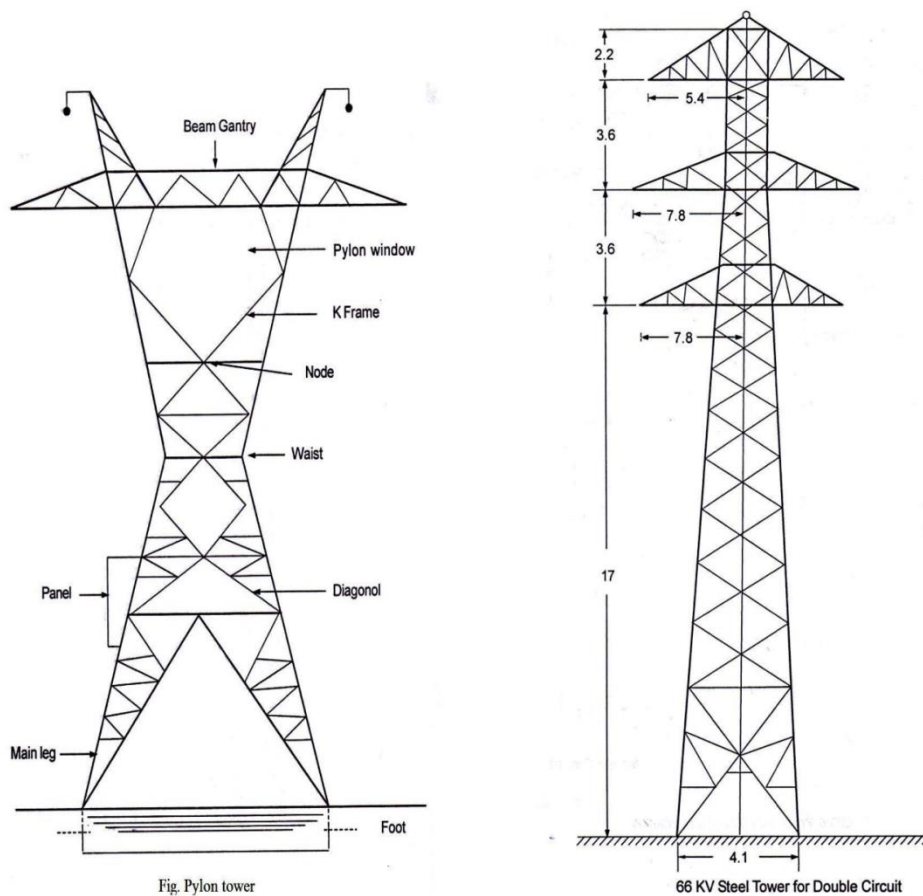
KV steel tower for double circuit with all the dimensions is given in figure.
